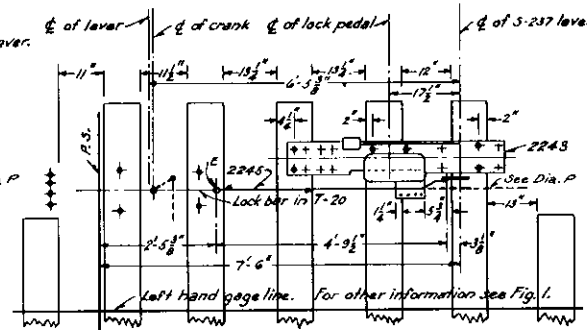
L.H. LAYOUT 30 FT. SWITCH RAIL - 3 HOLE 130 LB. RAIL.
